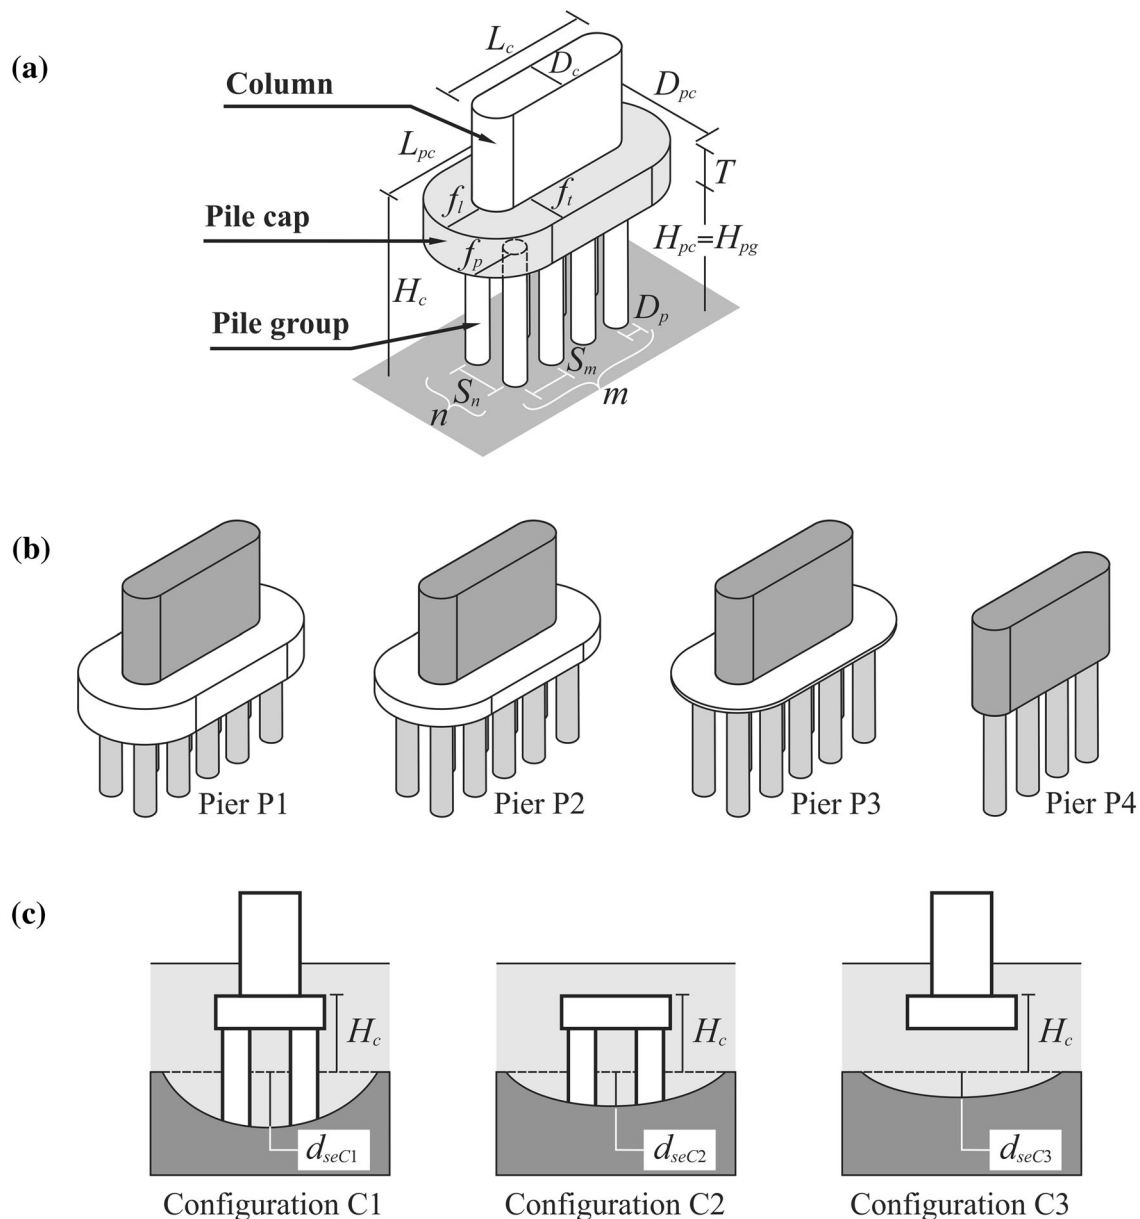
a Complex piers geometry, b pile-supported piers tested, and c pier configurations
